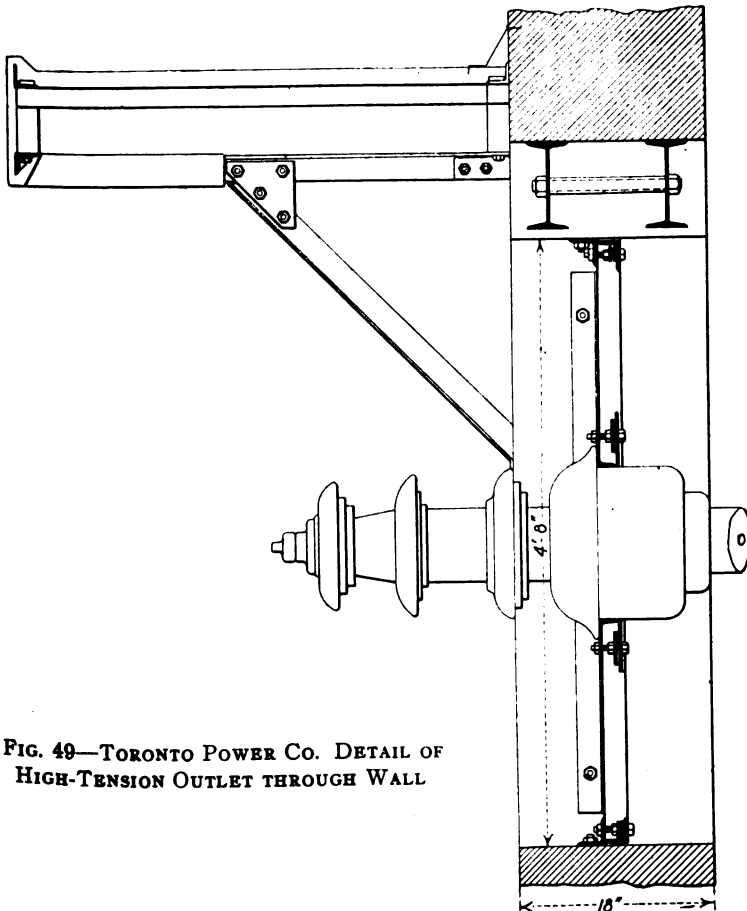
TORONTO POWER CO. DETAIL OF HIGH-TENSION OUTLET THROUGH WALL
